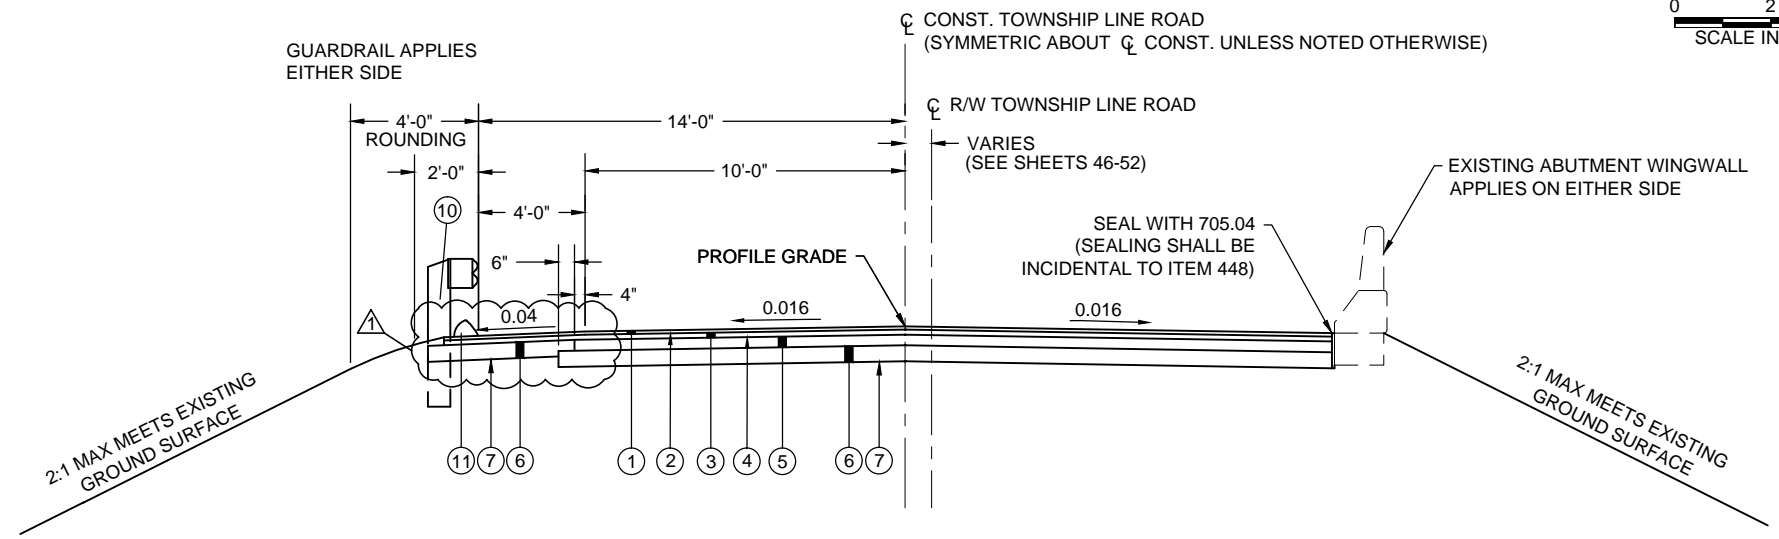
DETAIL - APPROACH PAVEMENT AT EXISTING ABUTMENT
